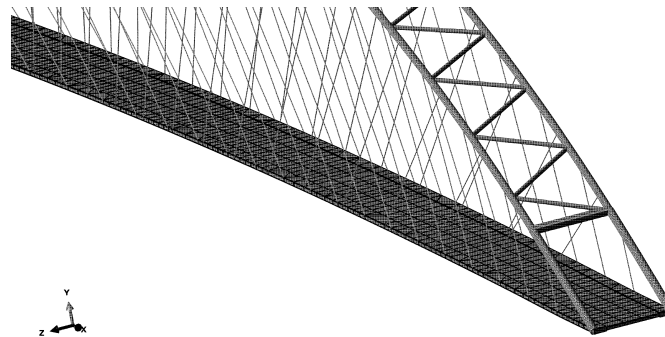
Network arch members with the wind portal frame side columns as part of the arch and top girder as end of the diagonal wind bracing.
